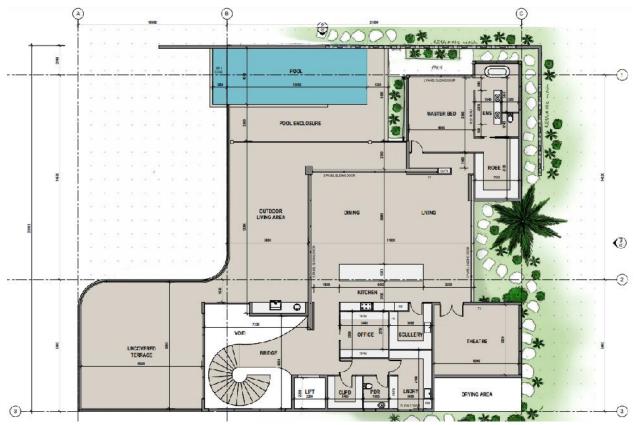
Site Plan (Source: Bàlay Vandyke, 2023)
